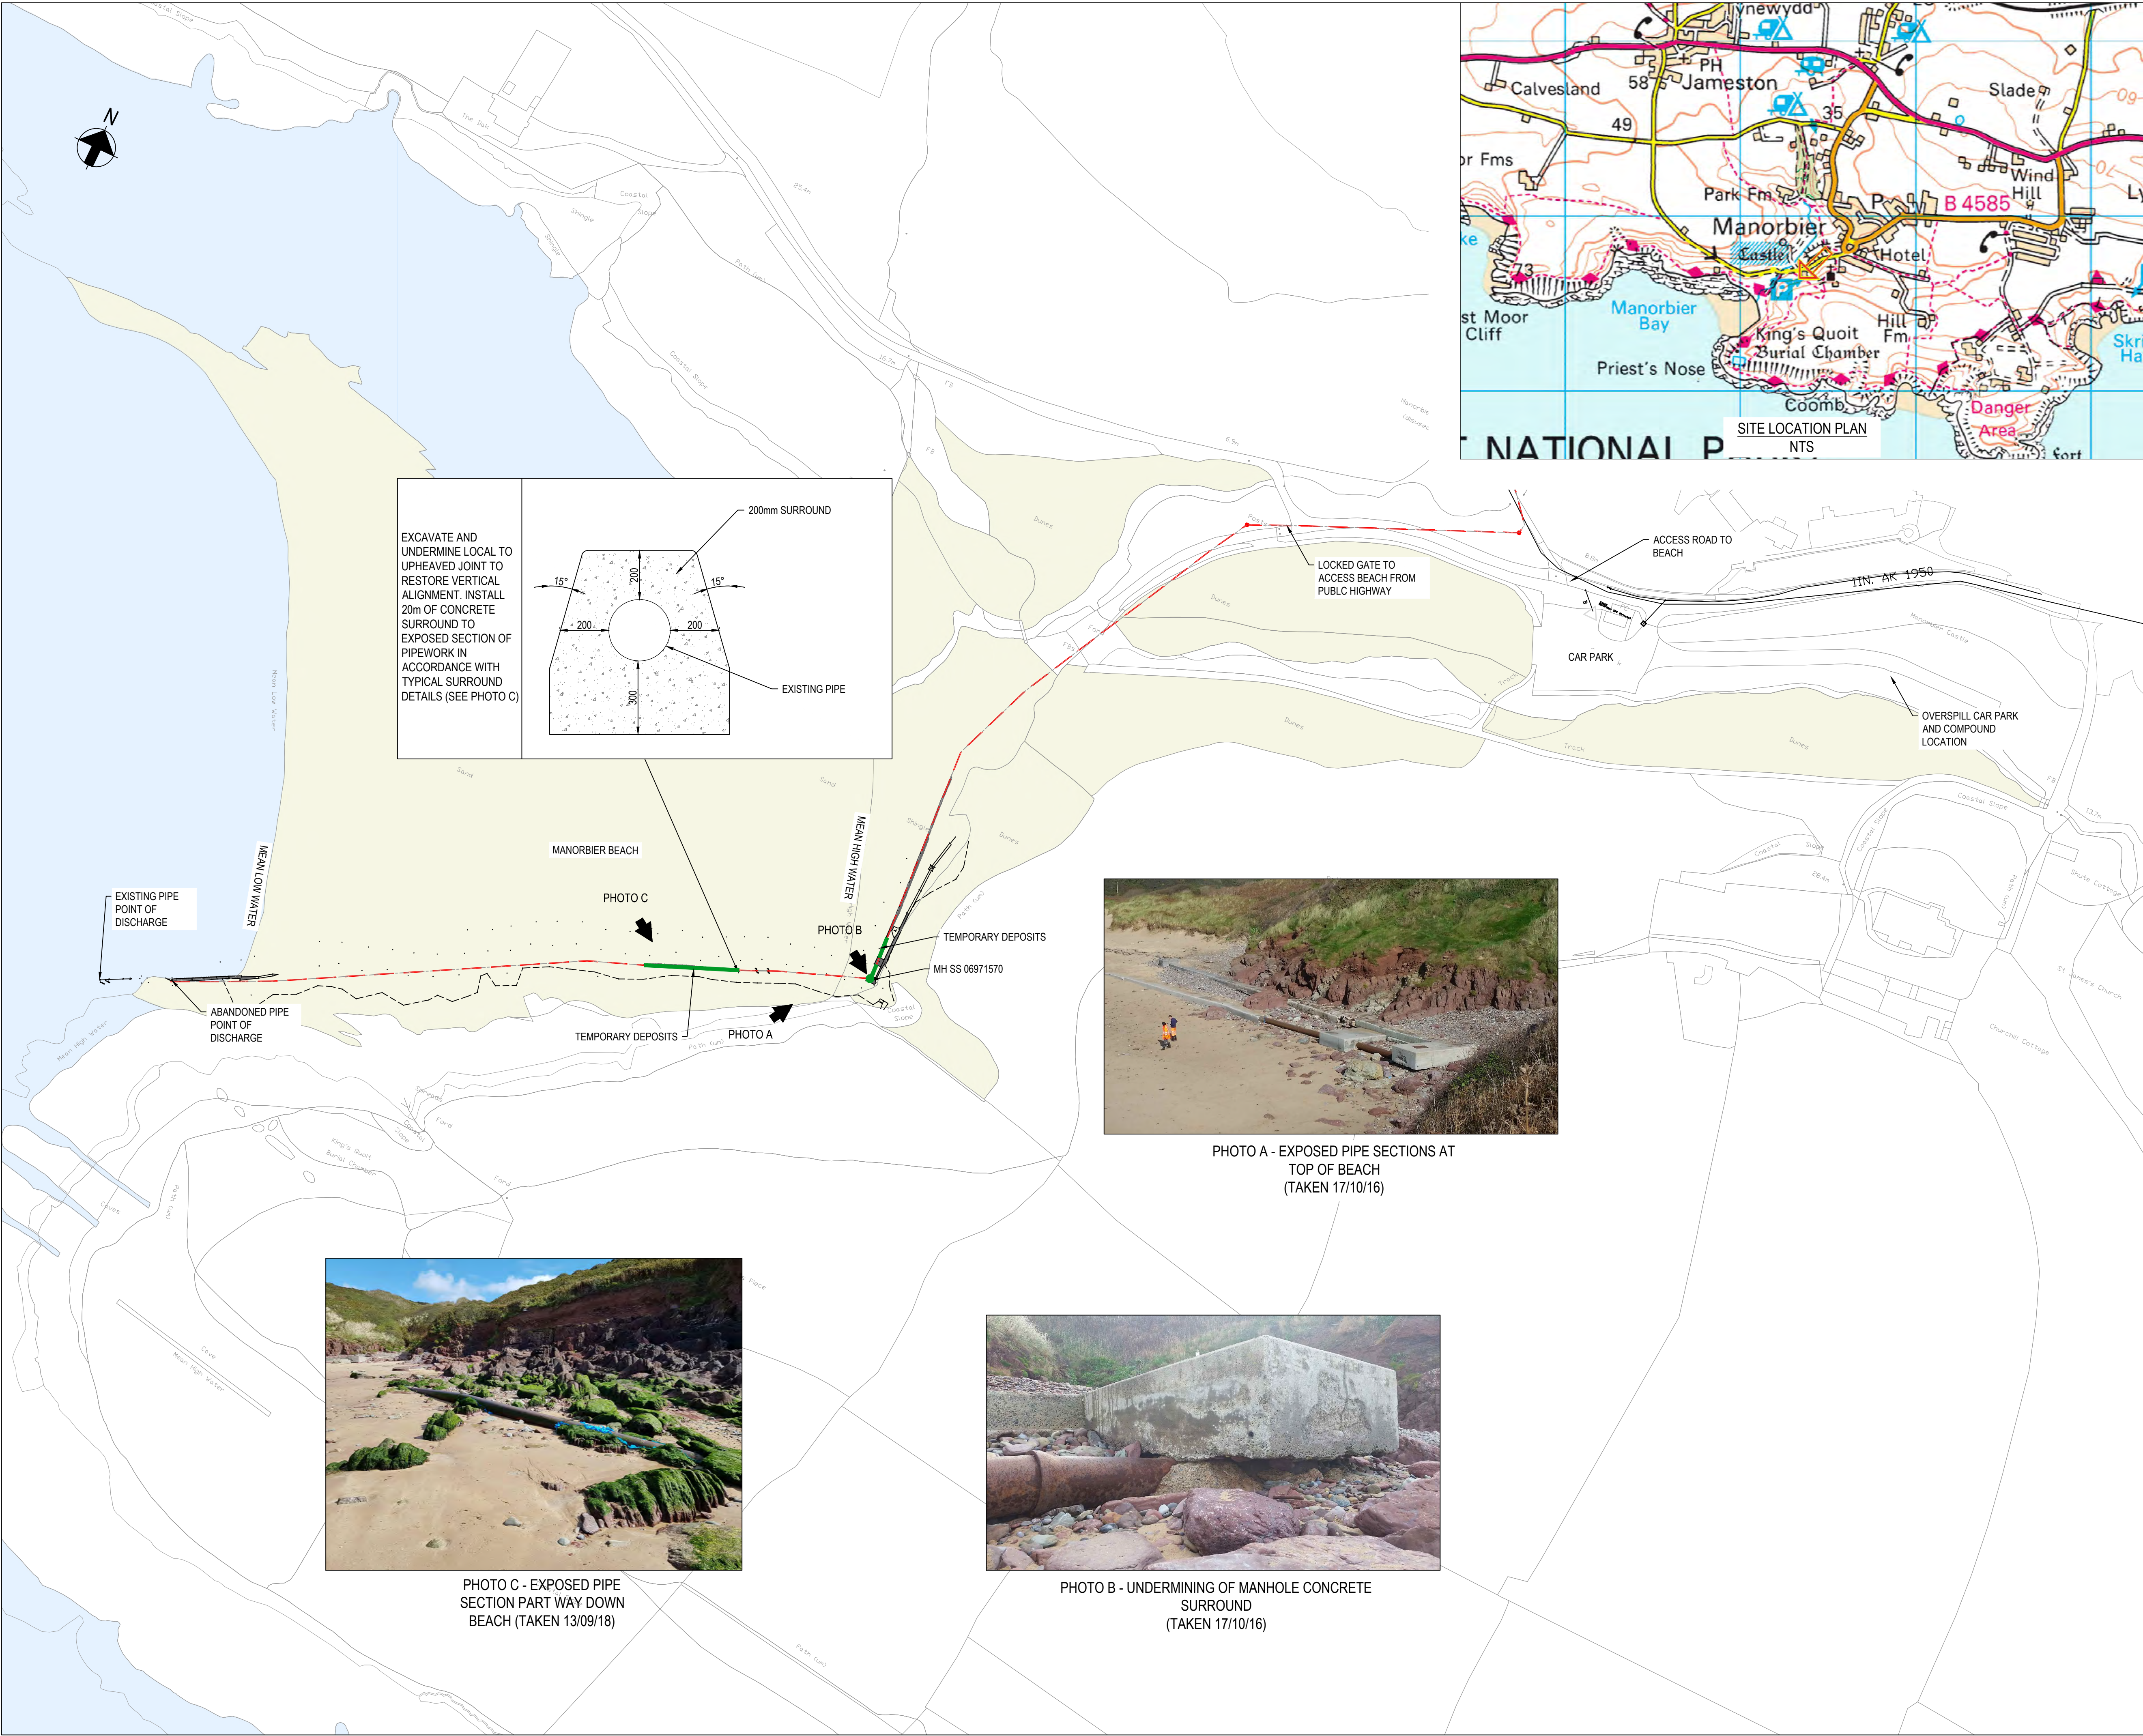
PHOTO A - EXPOSED PIPE SECTIONS AT TOP OF BEACH (TAKEN 17/10/16)
